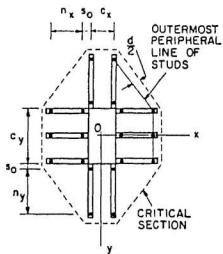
Shear studs and arrangement around an interior column (adapted from [41]).
